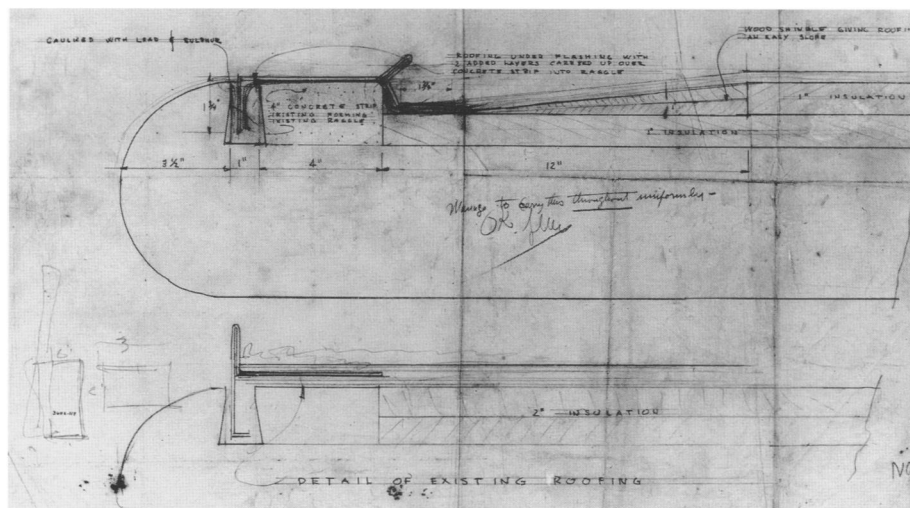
The flashing, although not original, is similar to a detail shown on this Frank Lloyd Wright drawing, "Detail of Existing Roofing" (undated drawing), referred to as drawing 3602.117 by the Frank Lloyd Wright Foundation. That this drawing uses the word "existing" seems to indicate that the roofing termination on the roof rolls was still being considered even after the roofing was installed. The first detail shows the configuration of the typical gravel stop described by Wright in 1938 in *The Architectural Forum*. The drawings of Frank Lloyd Wright are copyright ©2001 The Frank Lloyd Wright Foundation, Scottsdale, Ariz.
